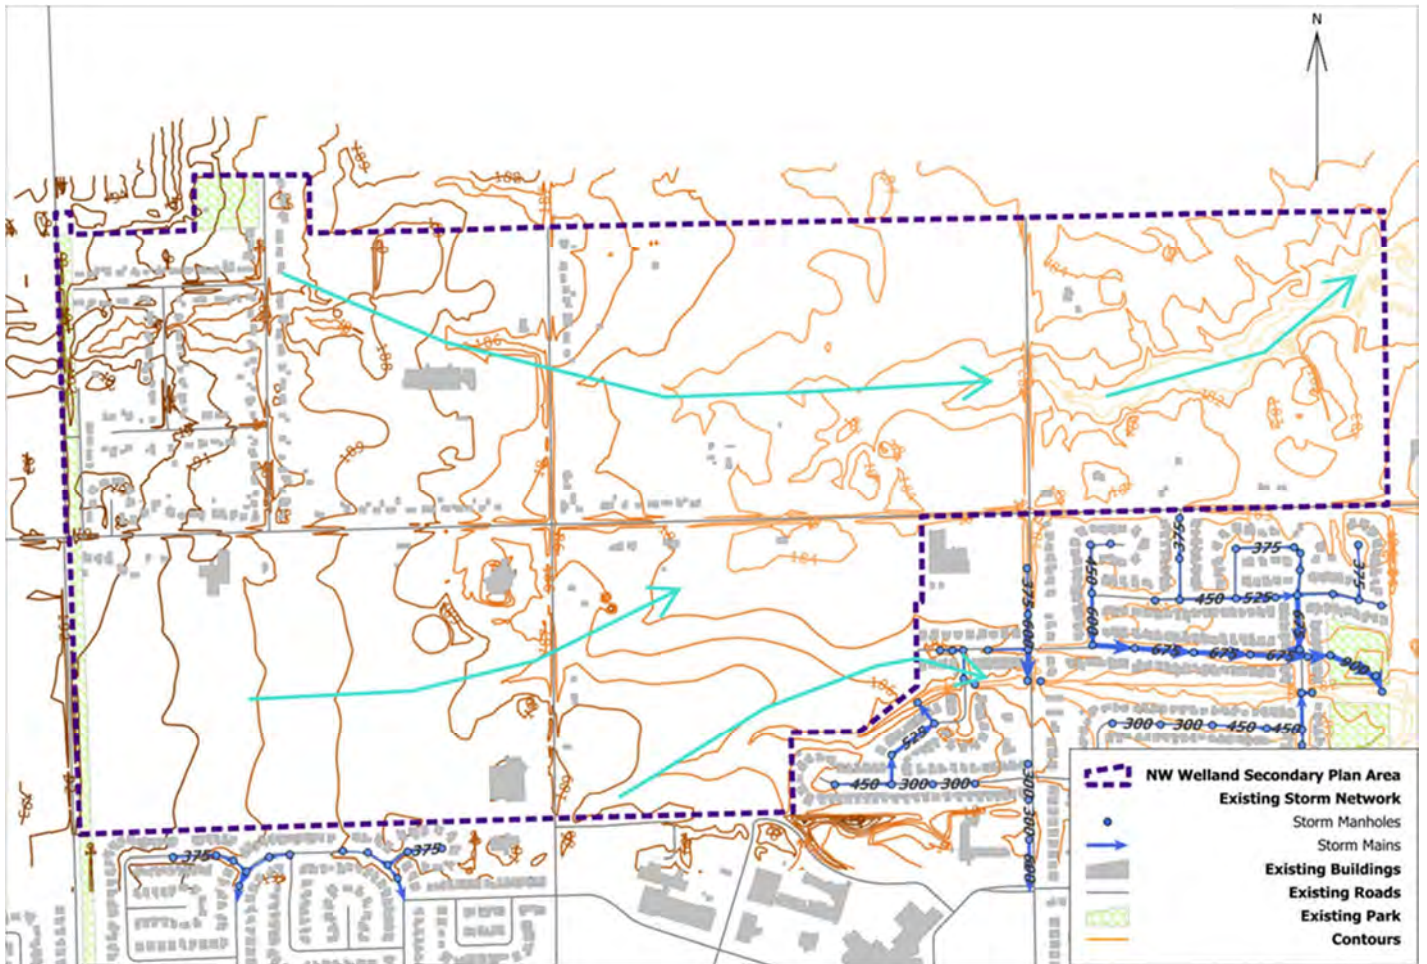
Schematic of Existing Stormwater Drainage Path
